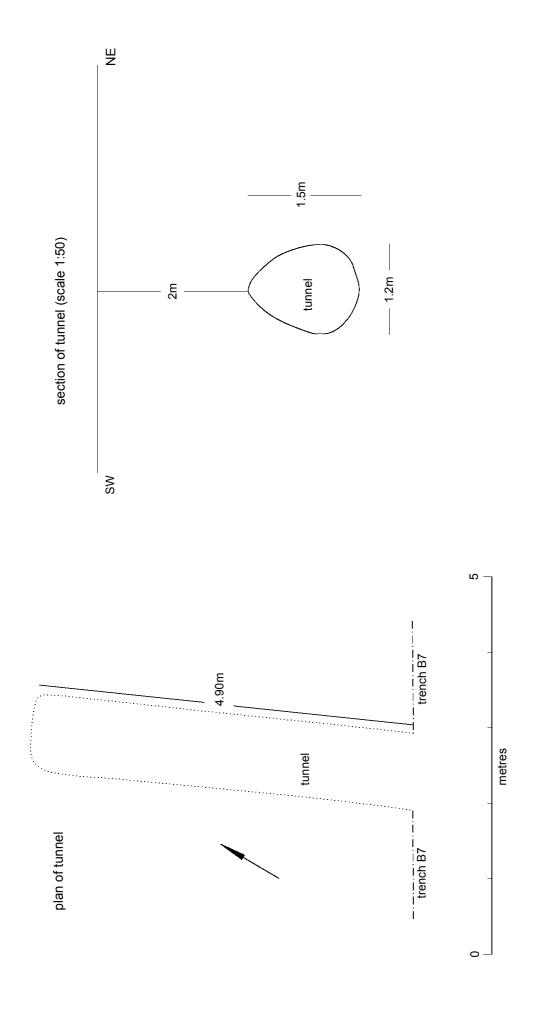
Area F east: Army practice trenches :plan and section of tunnel running north from B7.
